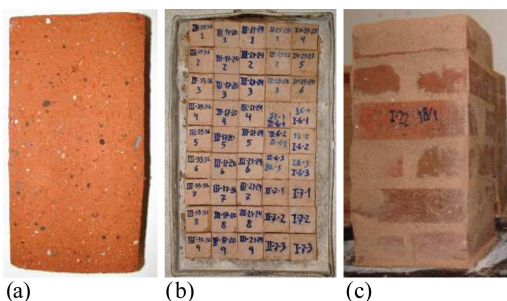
Clay brick masonry: (a) brick units; (b) mortar specimens; (c) brick prisms [source: University of Minho].
